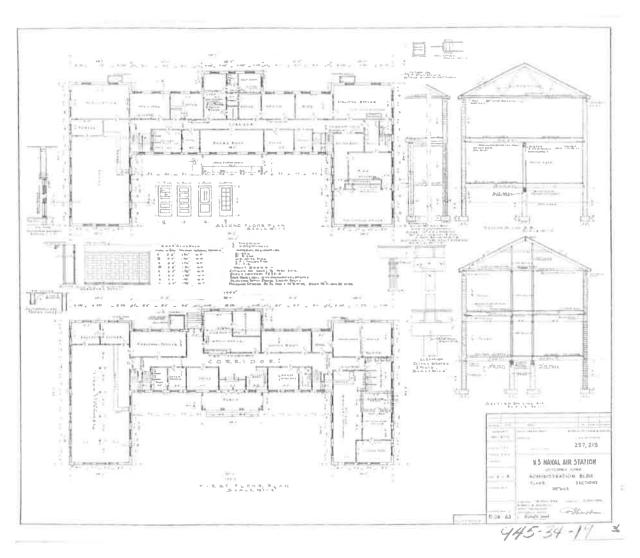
Floor plans (Russell B. Moore Co., May 15, 1943)
